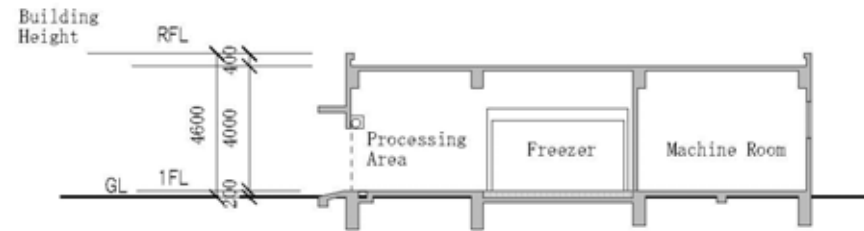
(11) Floor Plan for the Fishery Center Building
